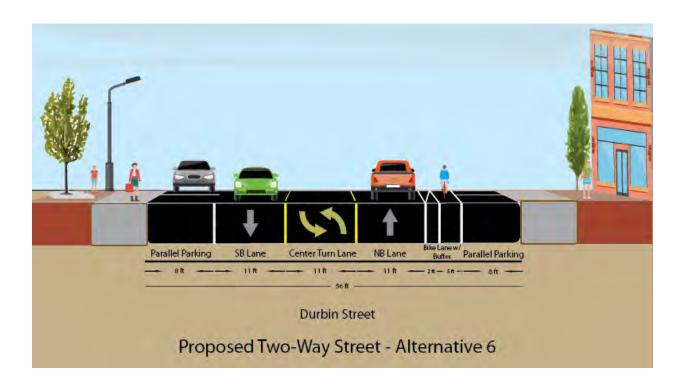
FINAL PROPOSED ALTERNATIVE TWO-WAY CROSS-SECTIONS
